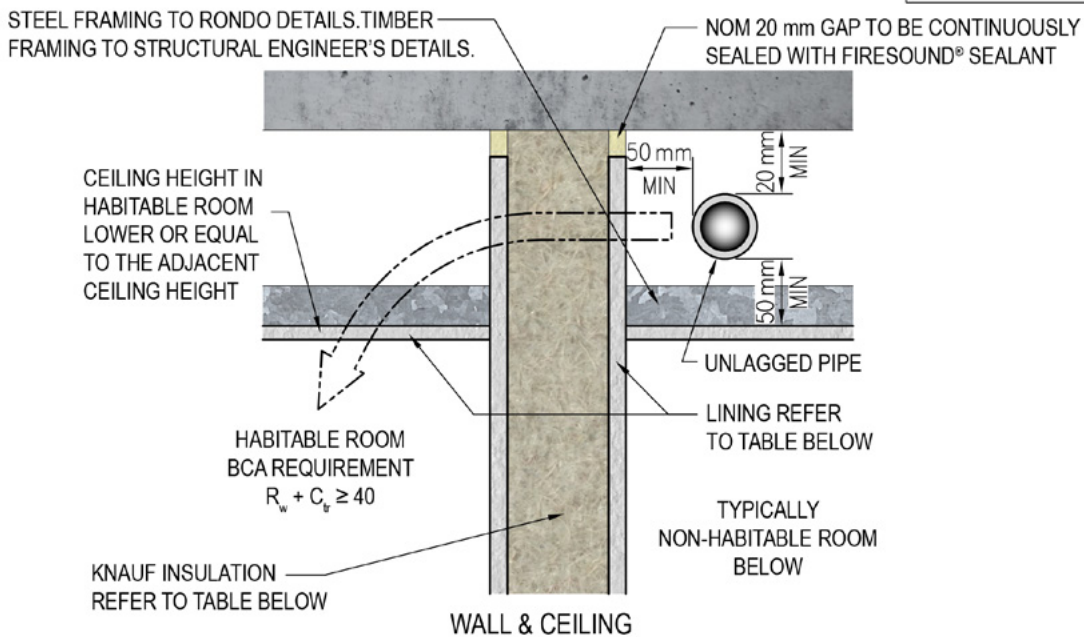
Soil & Waste Pipe Systems - $R_w + C_{tr}$ 40 (No Lagging) Ceiling and Wall Systems
